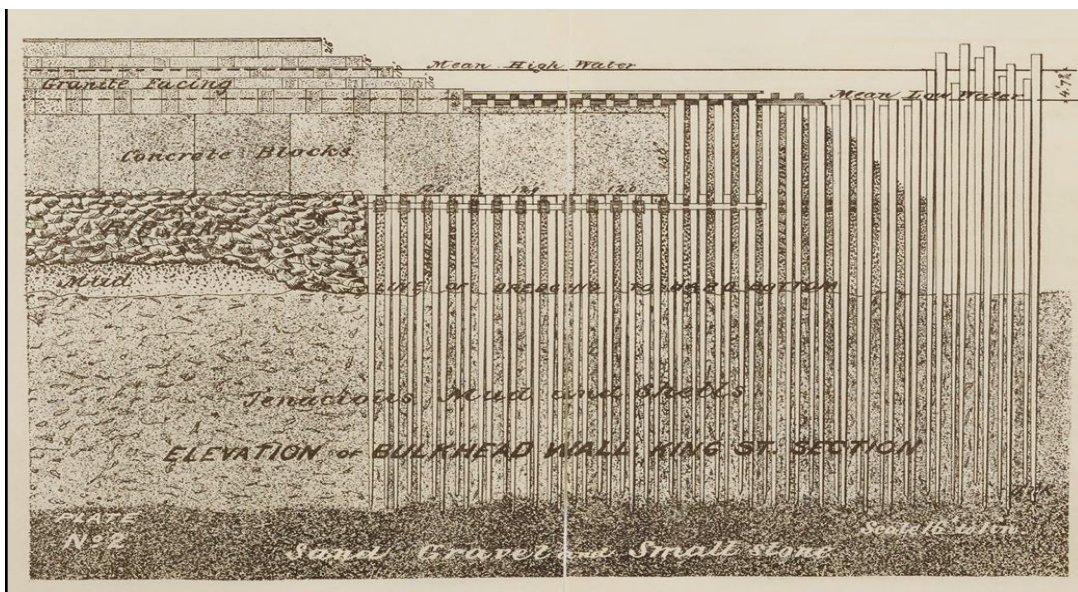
Elevation of Greene's 1876 type bulkhead introduced at the foot of King Street on the Hudson River in 1876. (Dock Dept. 1877 Annual Report:33)
